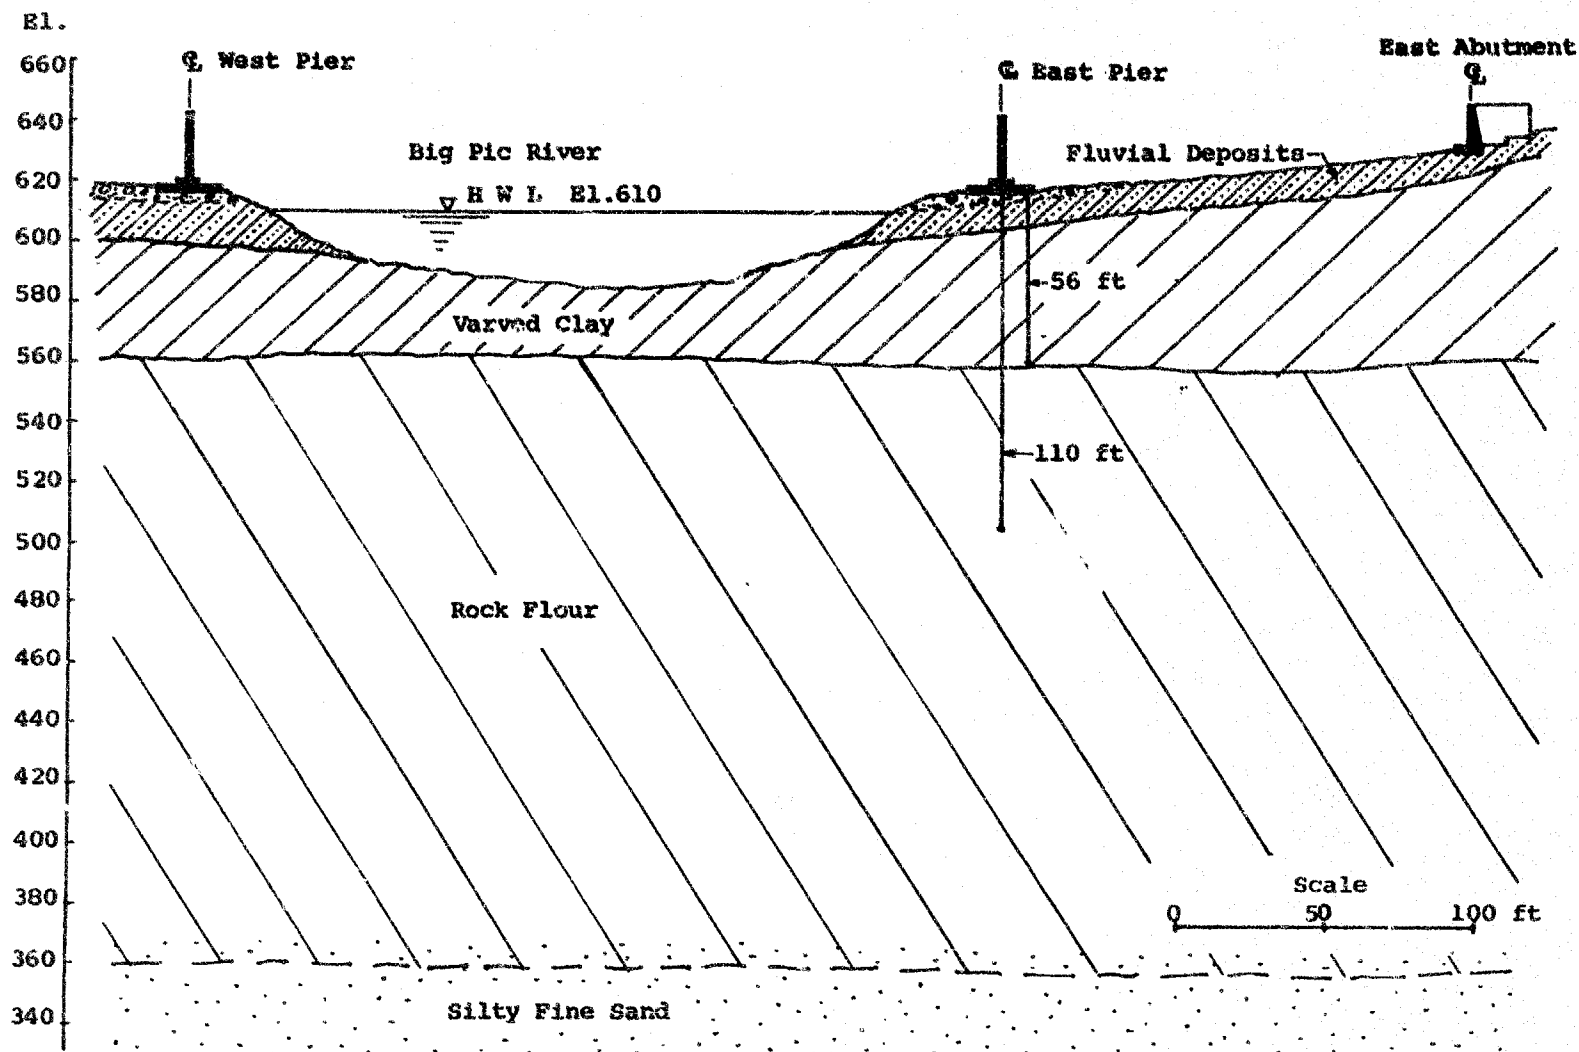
SUBSOIL PROFILE AT BIG PIC RIVER BRIDGE, MARATHON, ONTARIO
